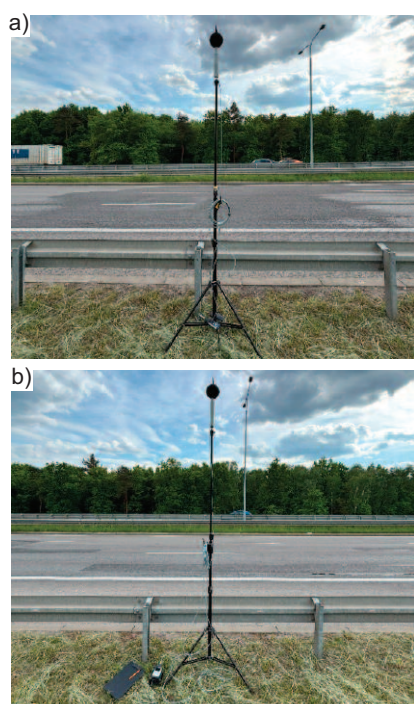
Location of measuring instruments in the cross-section of the: a) milled pavement; b) unmilled pavement
